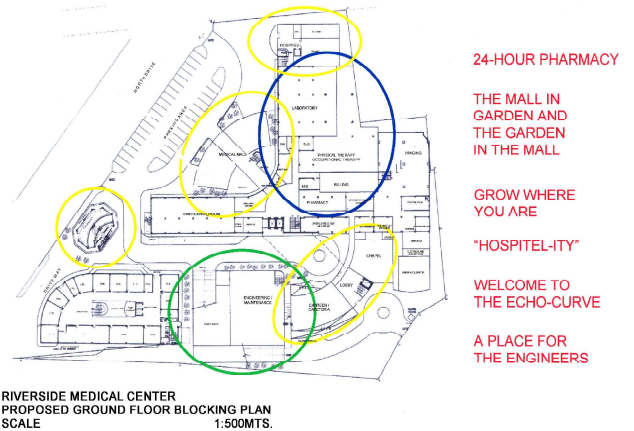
Features of the Proposed Blocking Plan at the Ground Floor
